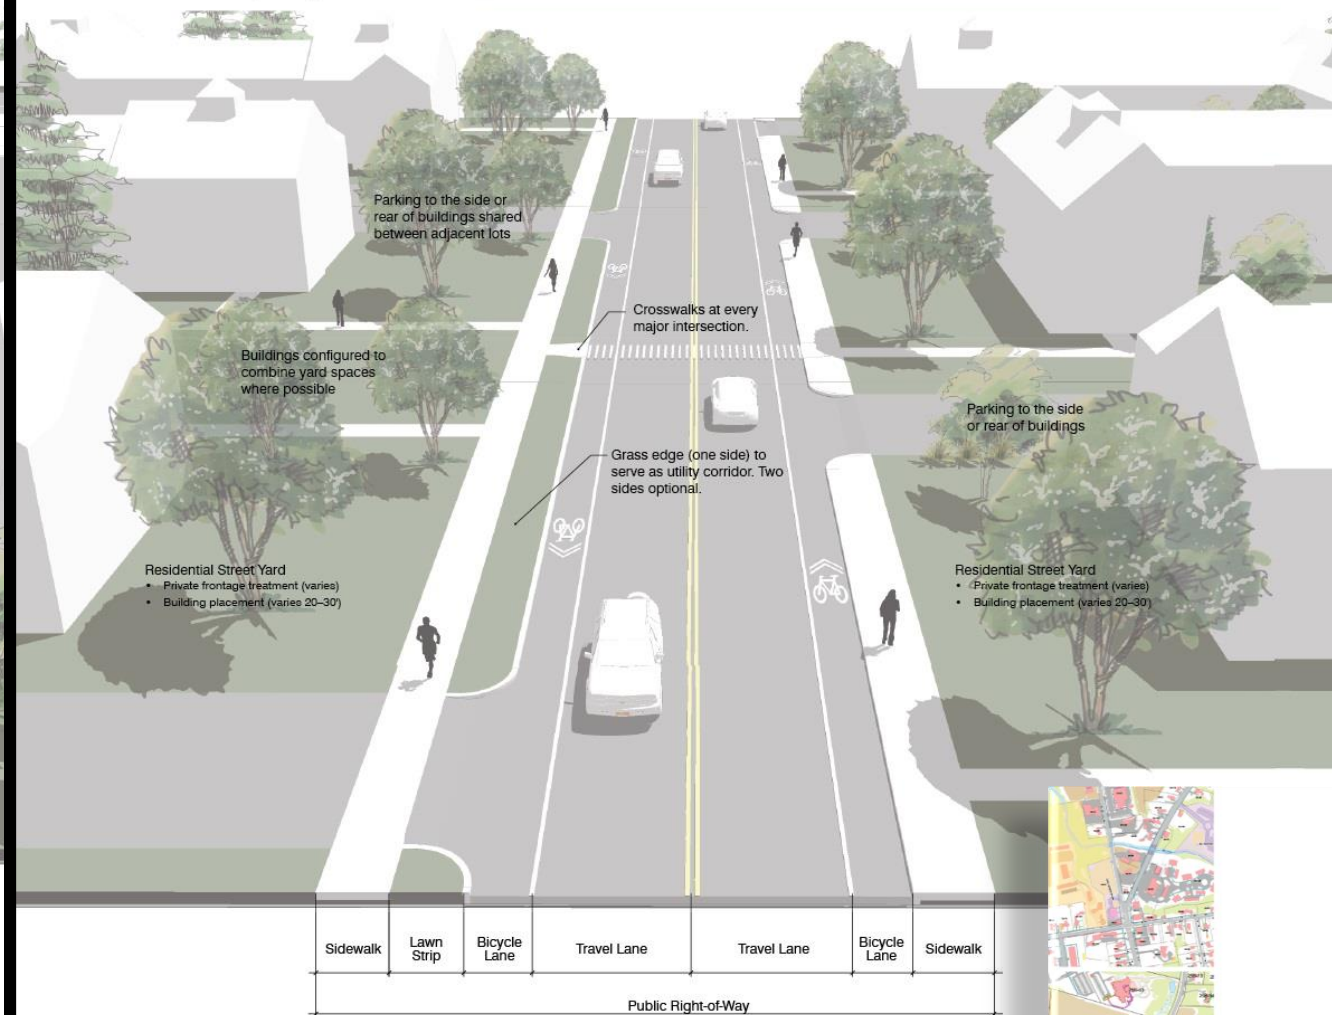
STREET TYPES - VILLAGE RESIDENTIAL STREET TYPE
